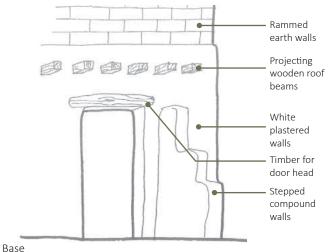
Traditional architectural elements & construction techniques in Tuhama plains
